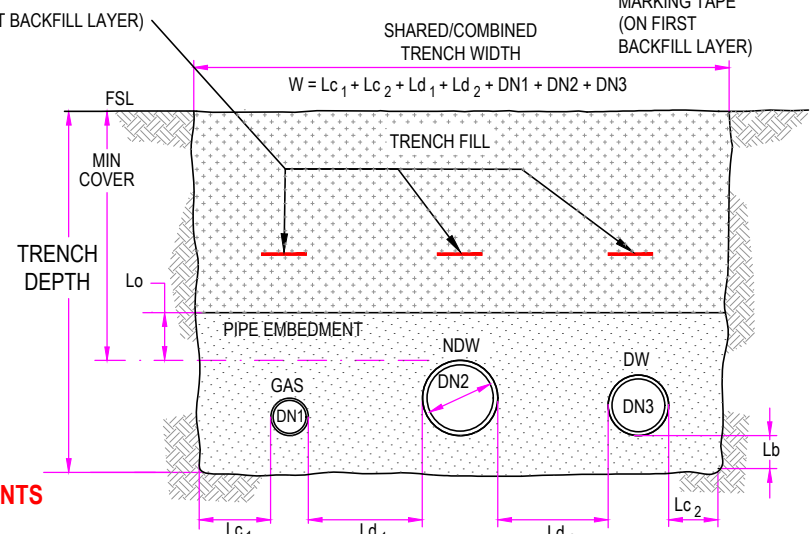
C: TYPICAL 3 PIPE SHARED TRENCH ARRANGEMENTS
